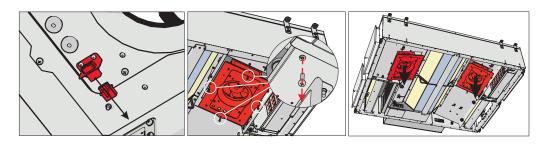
AmbertAir Compact 1 CX P ceiling-mounted version
